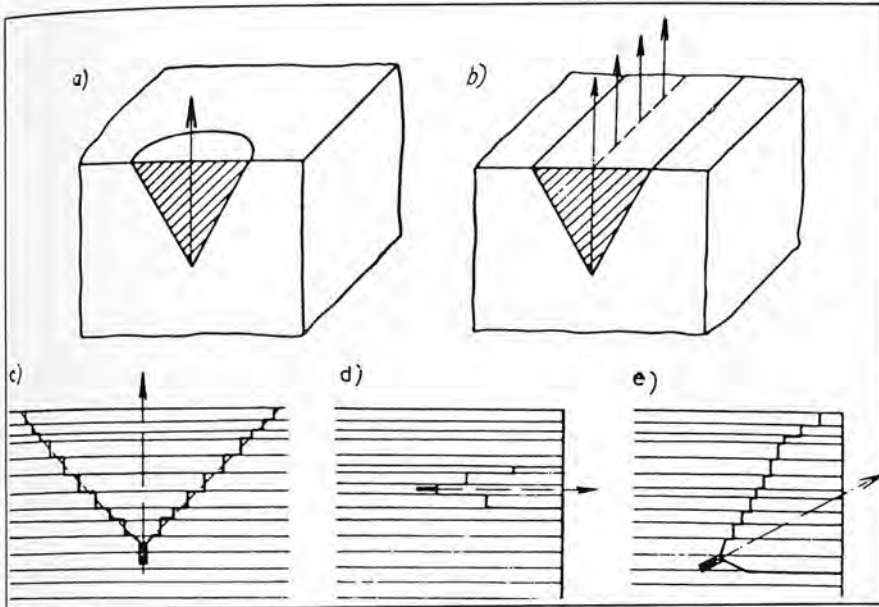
Geometry of rock mass assumed to be mobilised at failure (a) individual anchor in isotropic medium, (b) line of anchors in isotropic medium, (c) perpendicular to planes of discontinuity, (d) parallel to planes of discontinuity, (e) at an acute angle to planes of discontinuity.
